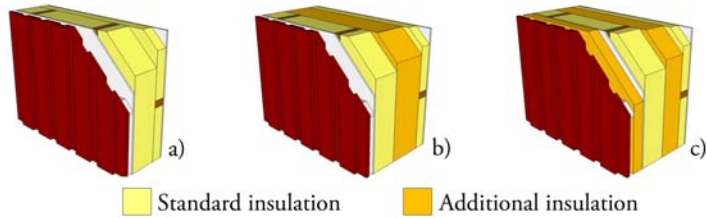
Alternative a; Standard wall construction. Alternative b; Additional insulation on the interior side of the wood frame construction. Alternative c; Additional insulation on the exterior and interior side of wood frame construction.
